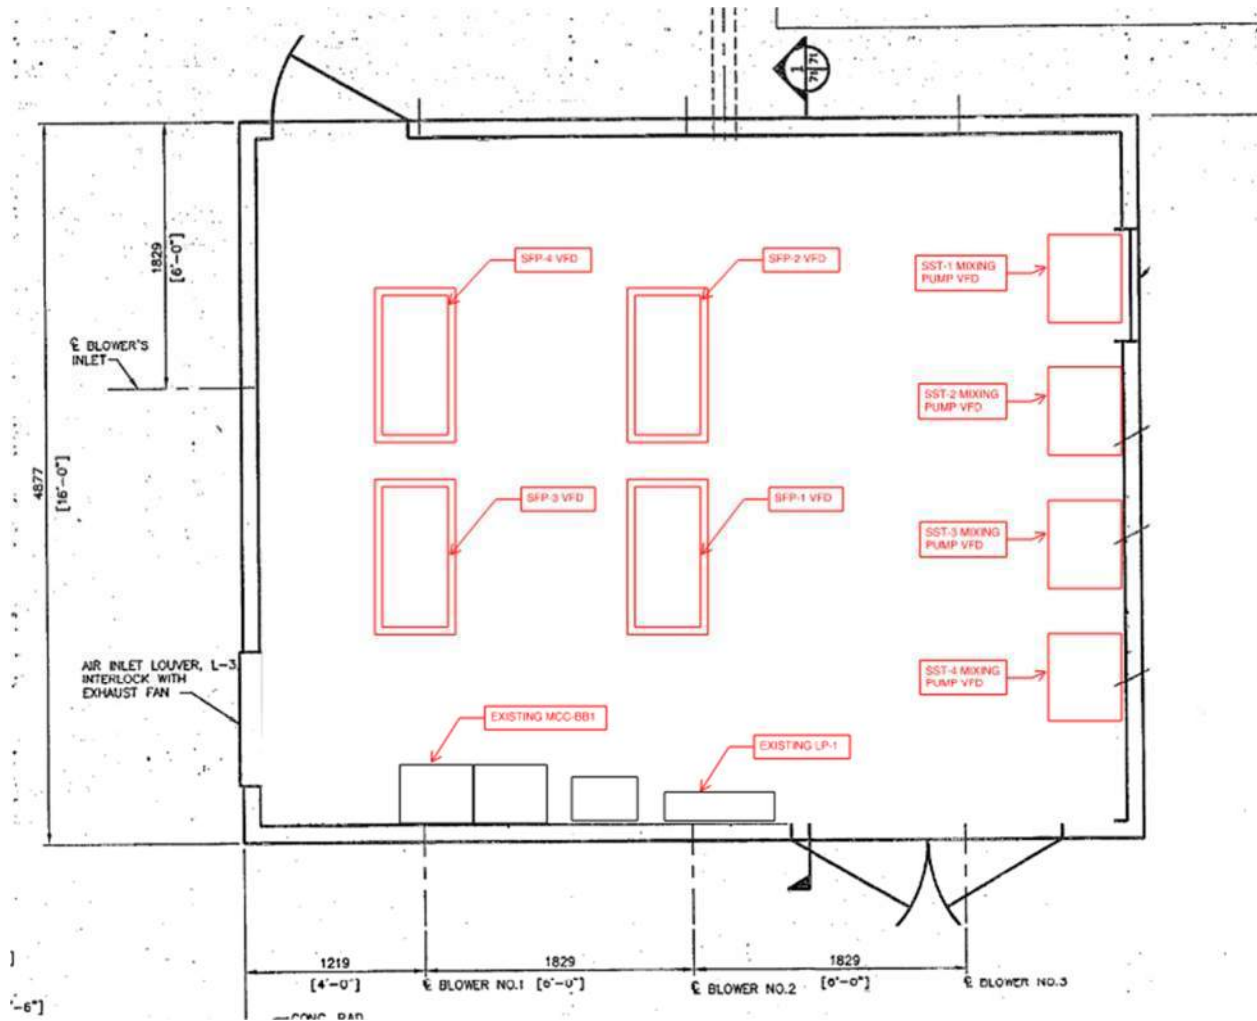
Alt-C2 Electrical Room Layout in SST 1/2 Blower Building
